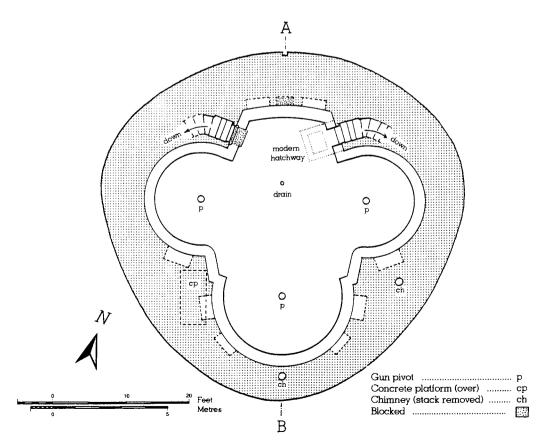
Martello Tower 'C', Lion Point, Jaywick; plan
